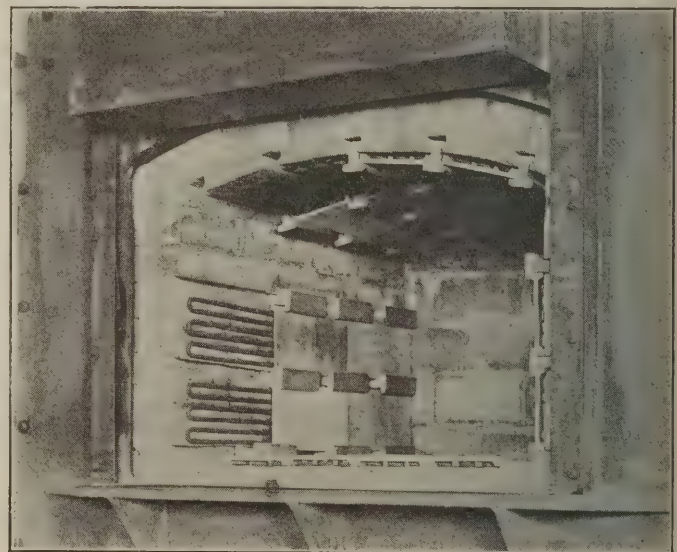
Interior View Showing Loop Heating Units and Wall Construction
